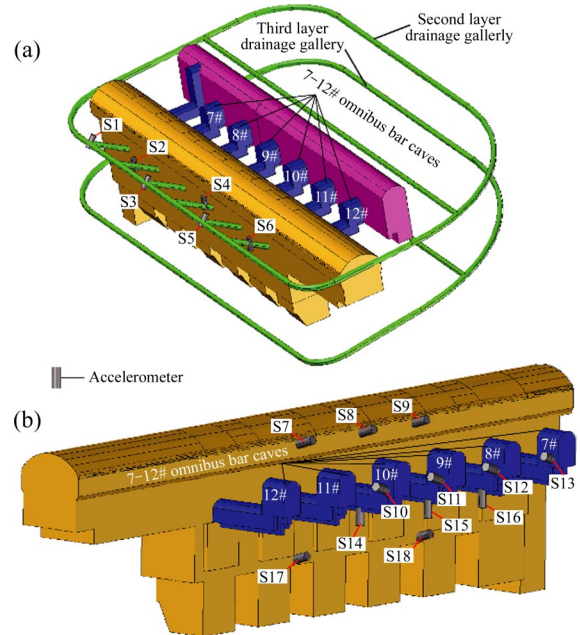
Spatial layout of accelerometers of Wudongde underground powerhouse caverns: (a) Upstream sidewall; (b) Downstream sidewall areas [38]
